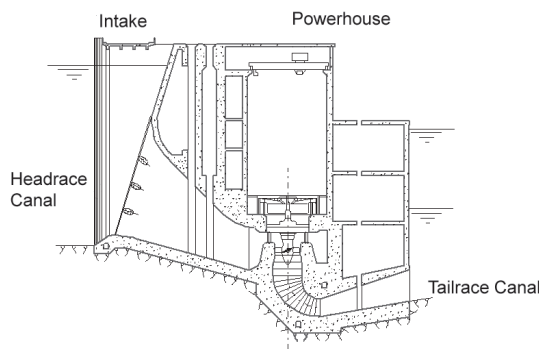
Typical cross-section of a project with an integral intake powerhouse.
